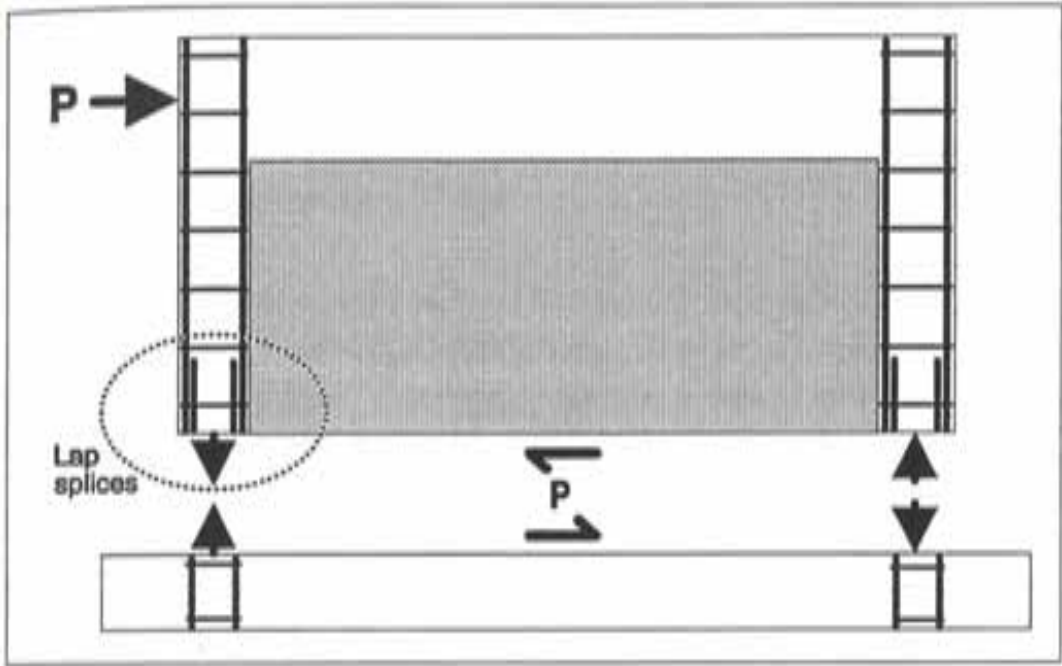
Weak column lap splices subjected to large tensile forces due to frame-wall action
